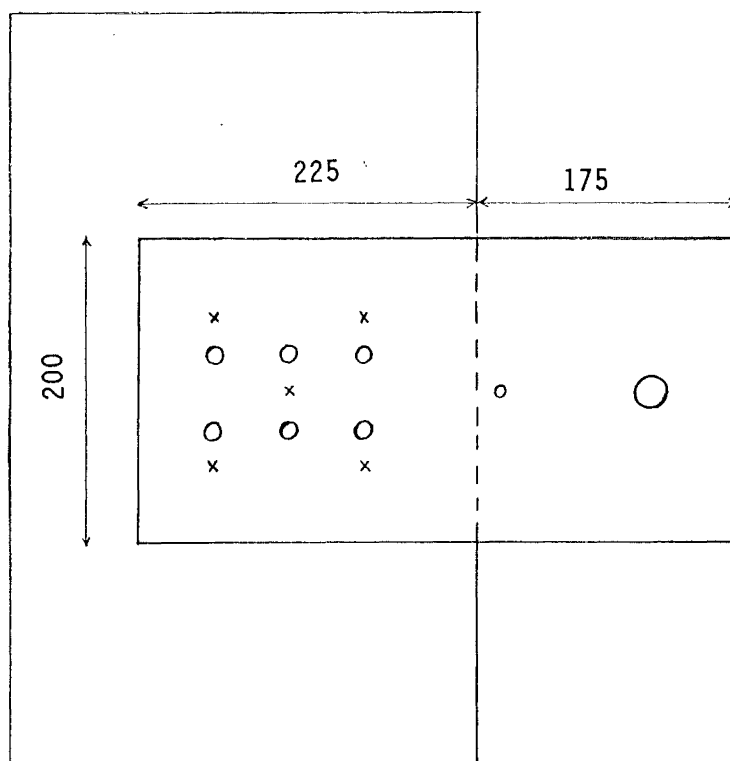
Gusset geometry and locations of nails and thermocouples
